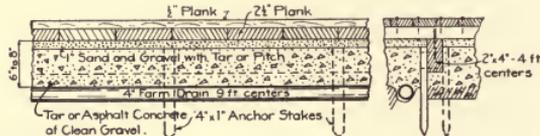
Detail of Asphalt or Coal-Tar Concrete Floor.
